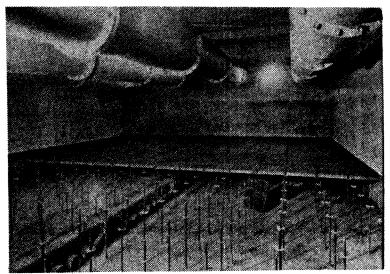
False bottom and strainer underdrainage system for backwashing with water and air
